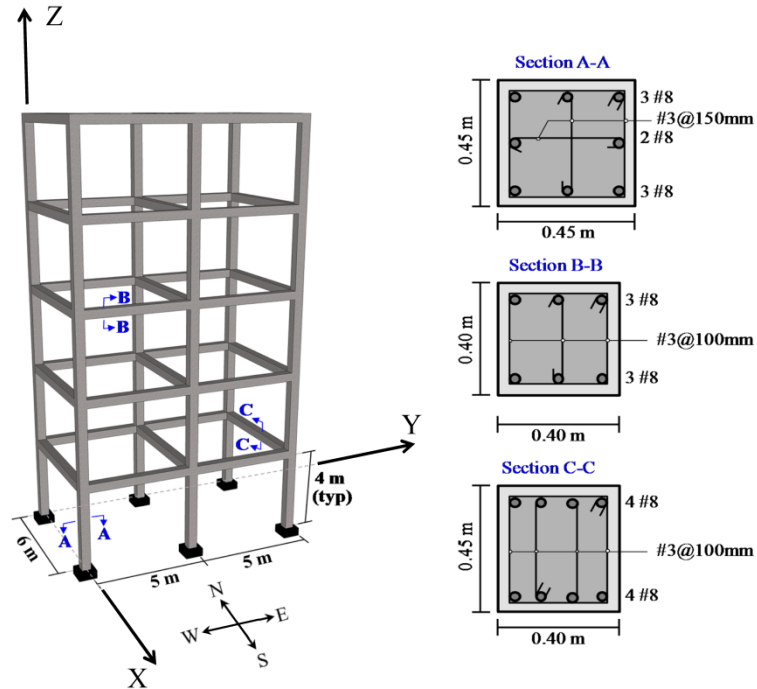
RC frame building structure: isometric view and cross-section of beams and columns.
